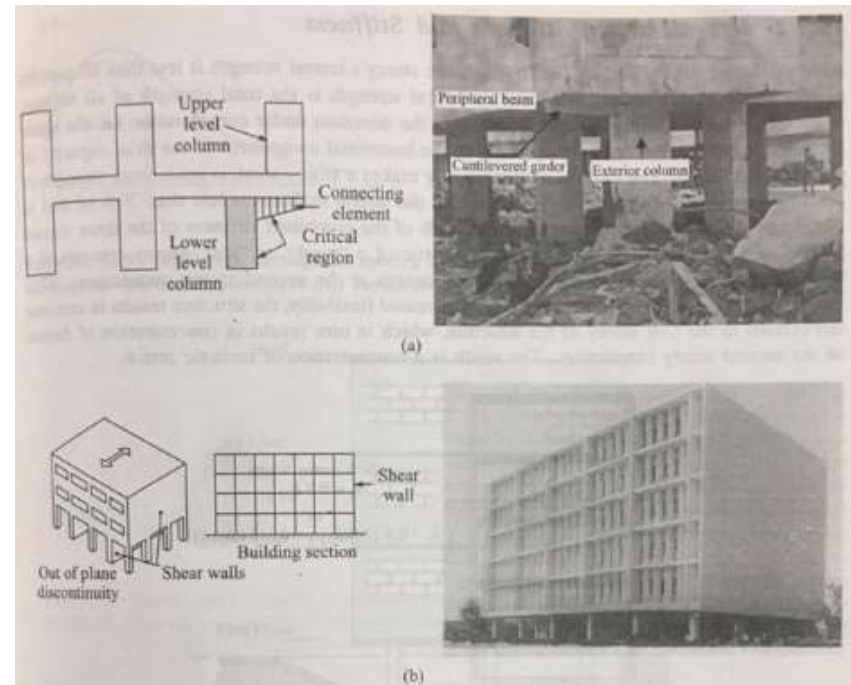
(a) Floating box construction in residential building in Ahmedabad, India; (b) Discontinuous shear wall.
